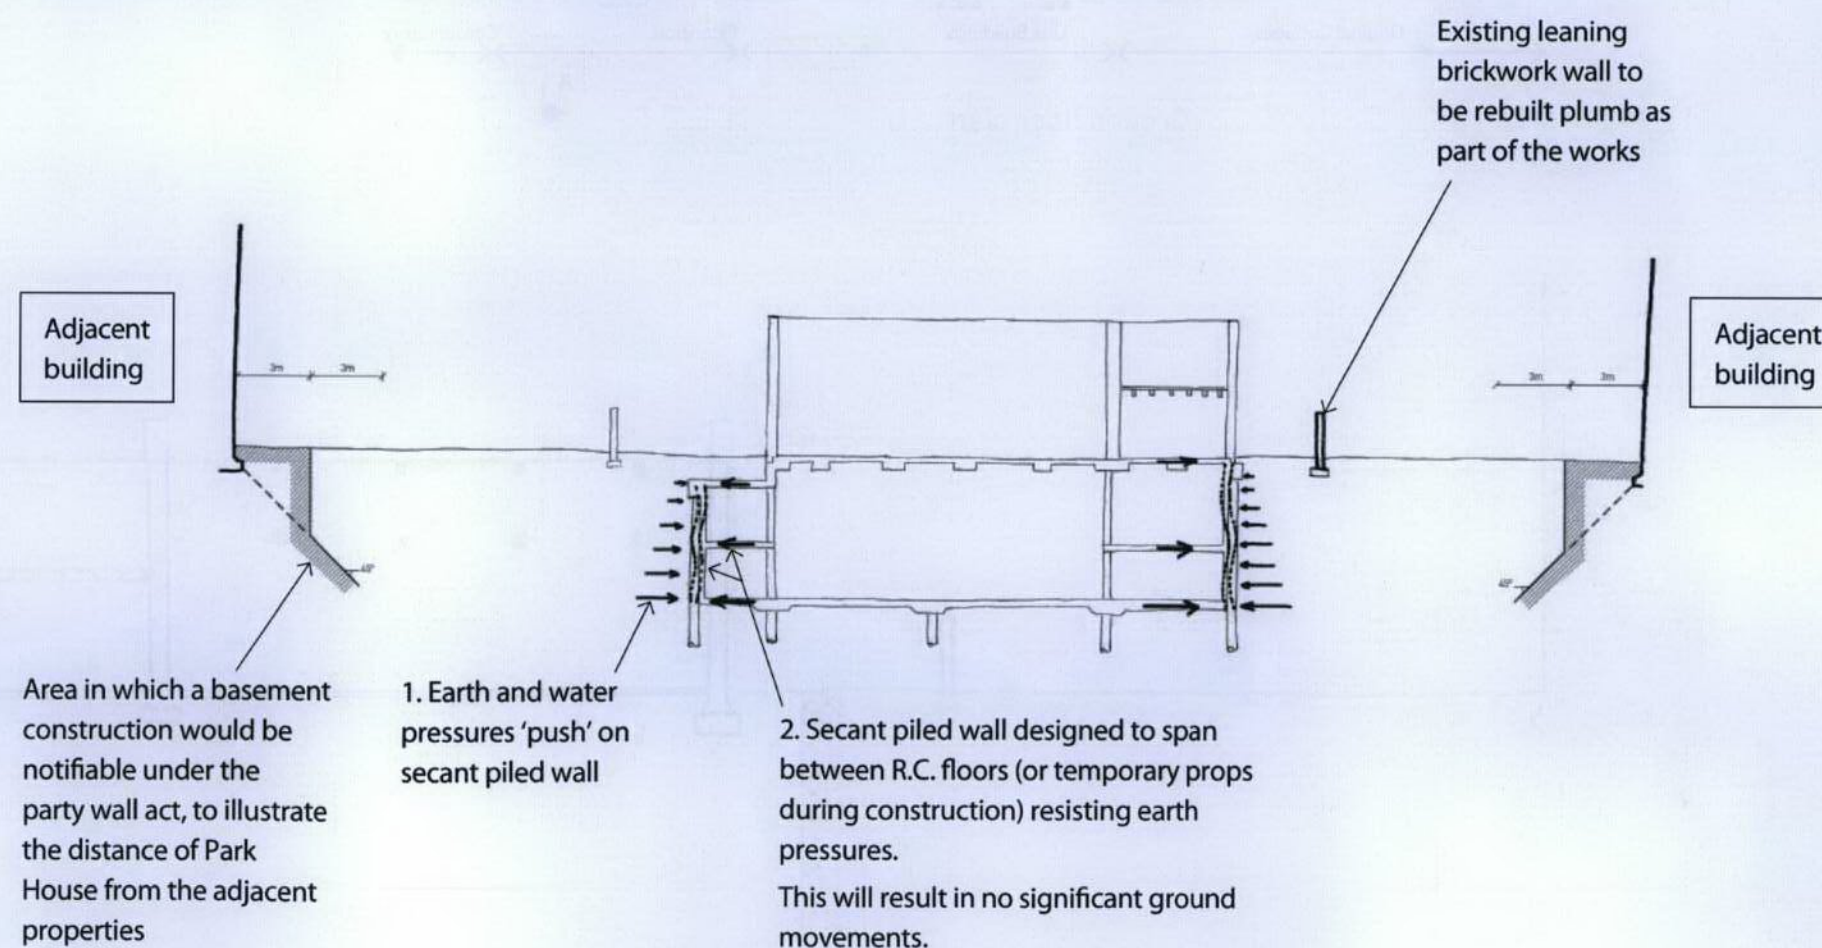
/01/18 and 19 show sections through the proposed new structure and its relationship to the existing adjacent buildings.
